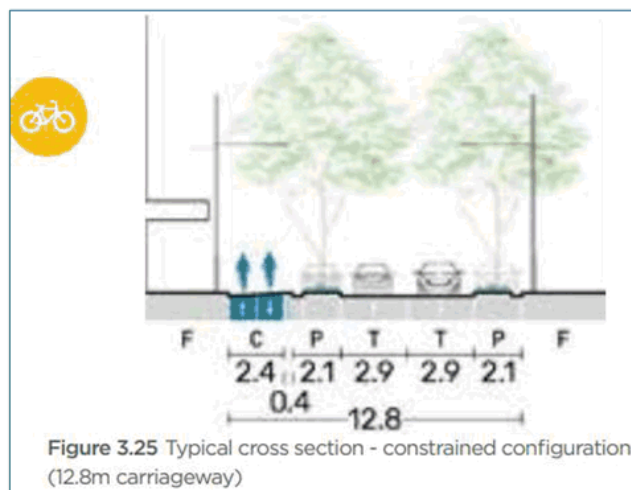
Typical cross section - constrained configuration (12.8m carriageway)
